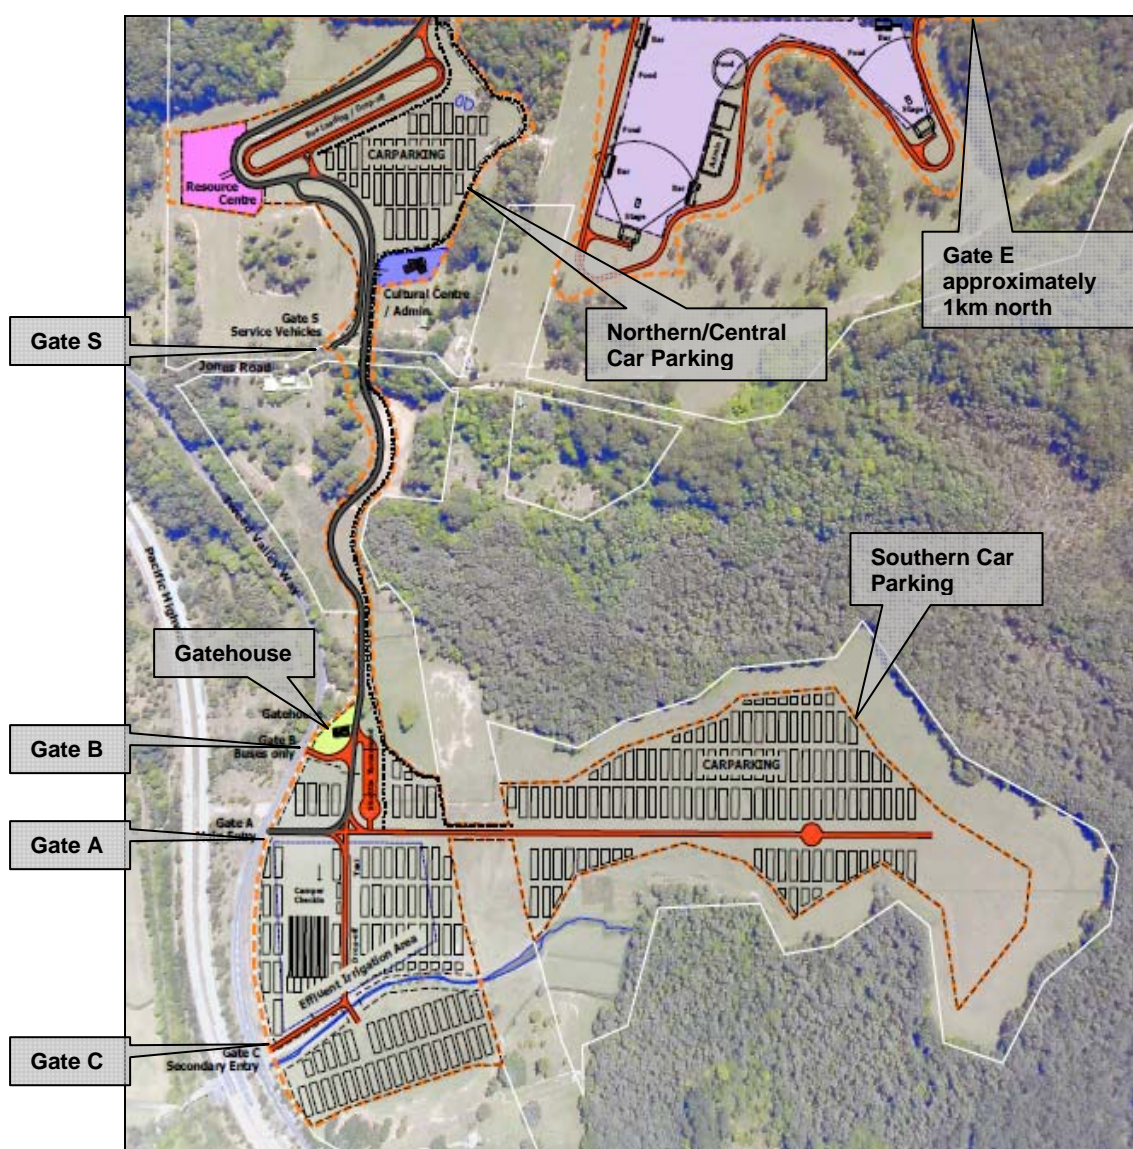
Site Access Points and Car Parking (source: Preferred Project Report)
